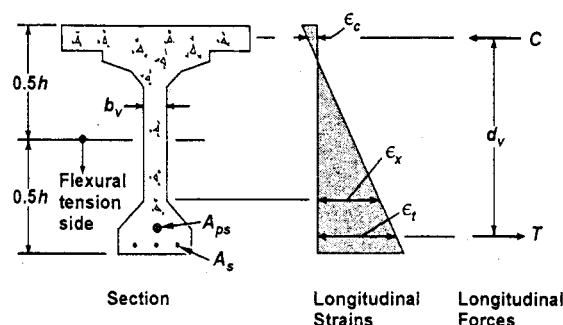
Longitudinal Strain, ϵ_x , for Sections Containing Less than the Minimum Amount of Transverse Reinforcement.
